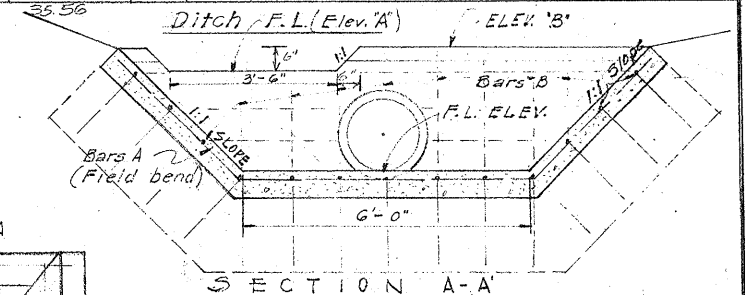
DETAILS OF CL.B CONCRETE RIPRAP PIPE HEADWALLS
